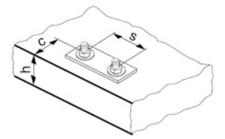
Edge distance, spacing and concrete slab thickness
